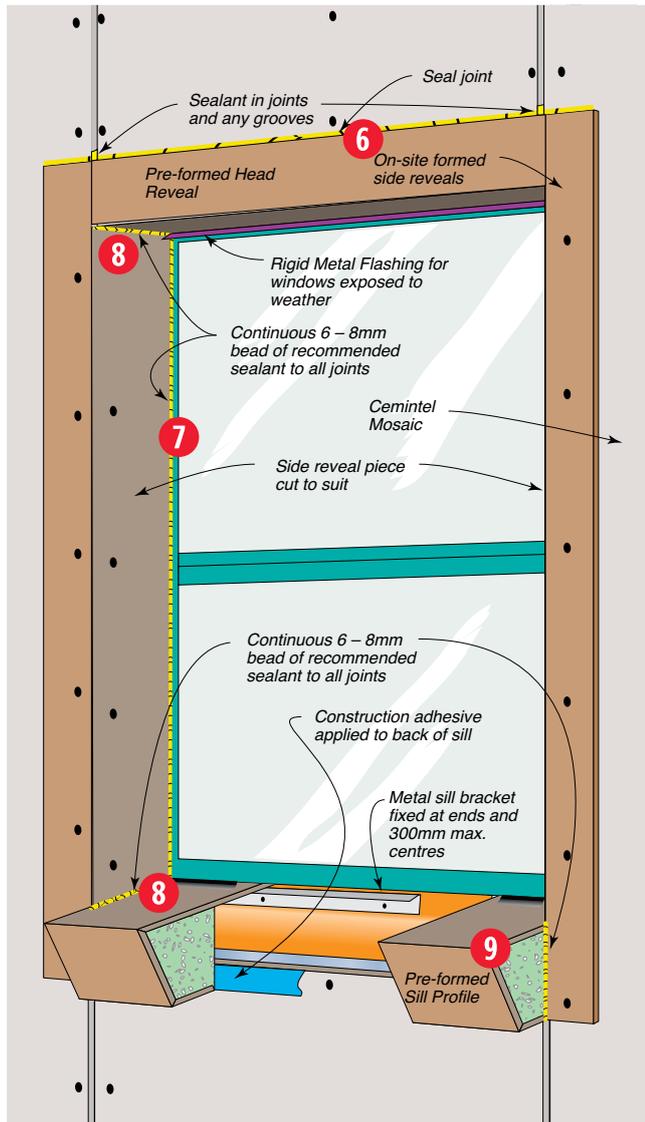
Installation of Cemintel Traditional Sill, Head and Side Reveals
